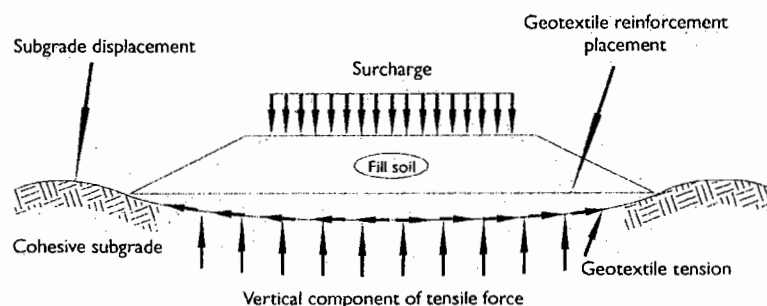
Geotextile-reinforcement foundation support by tension membrane.
